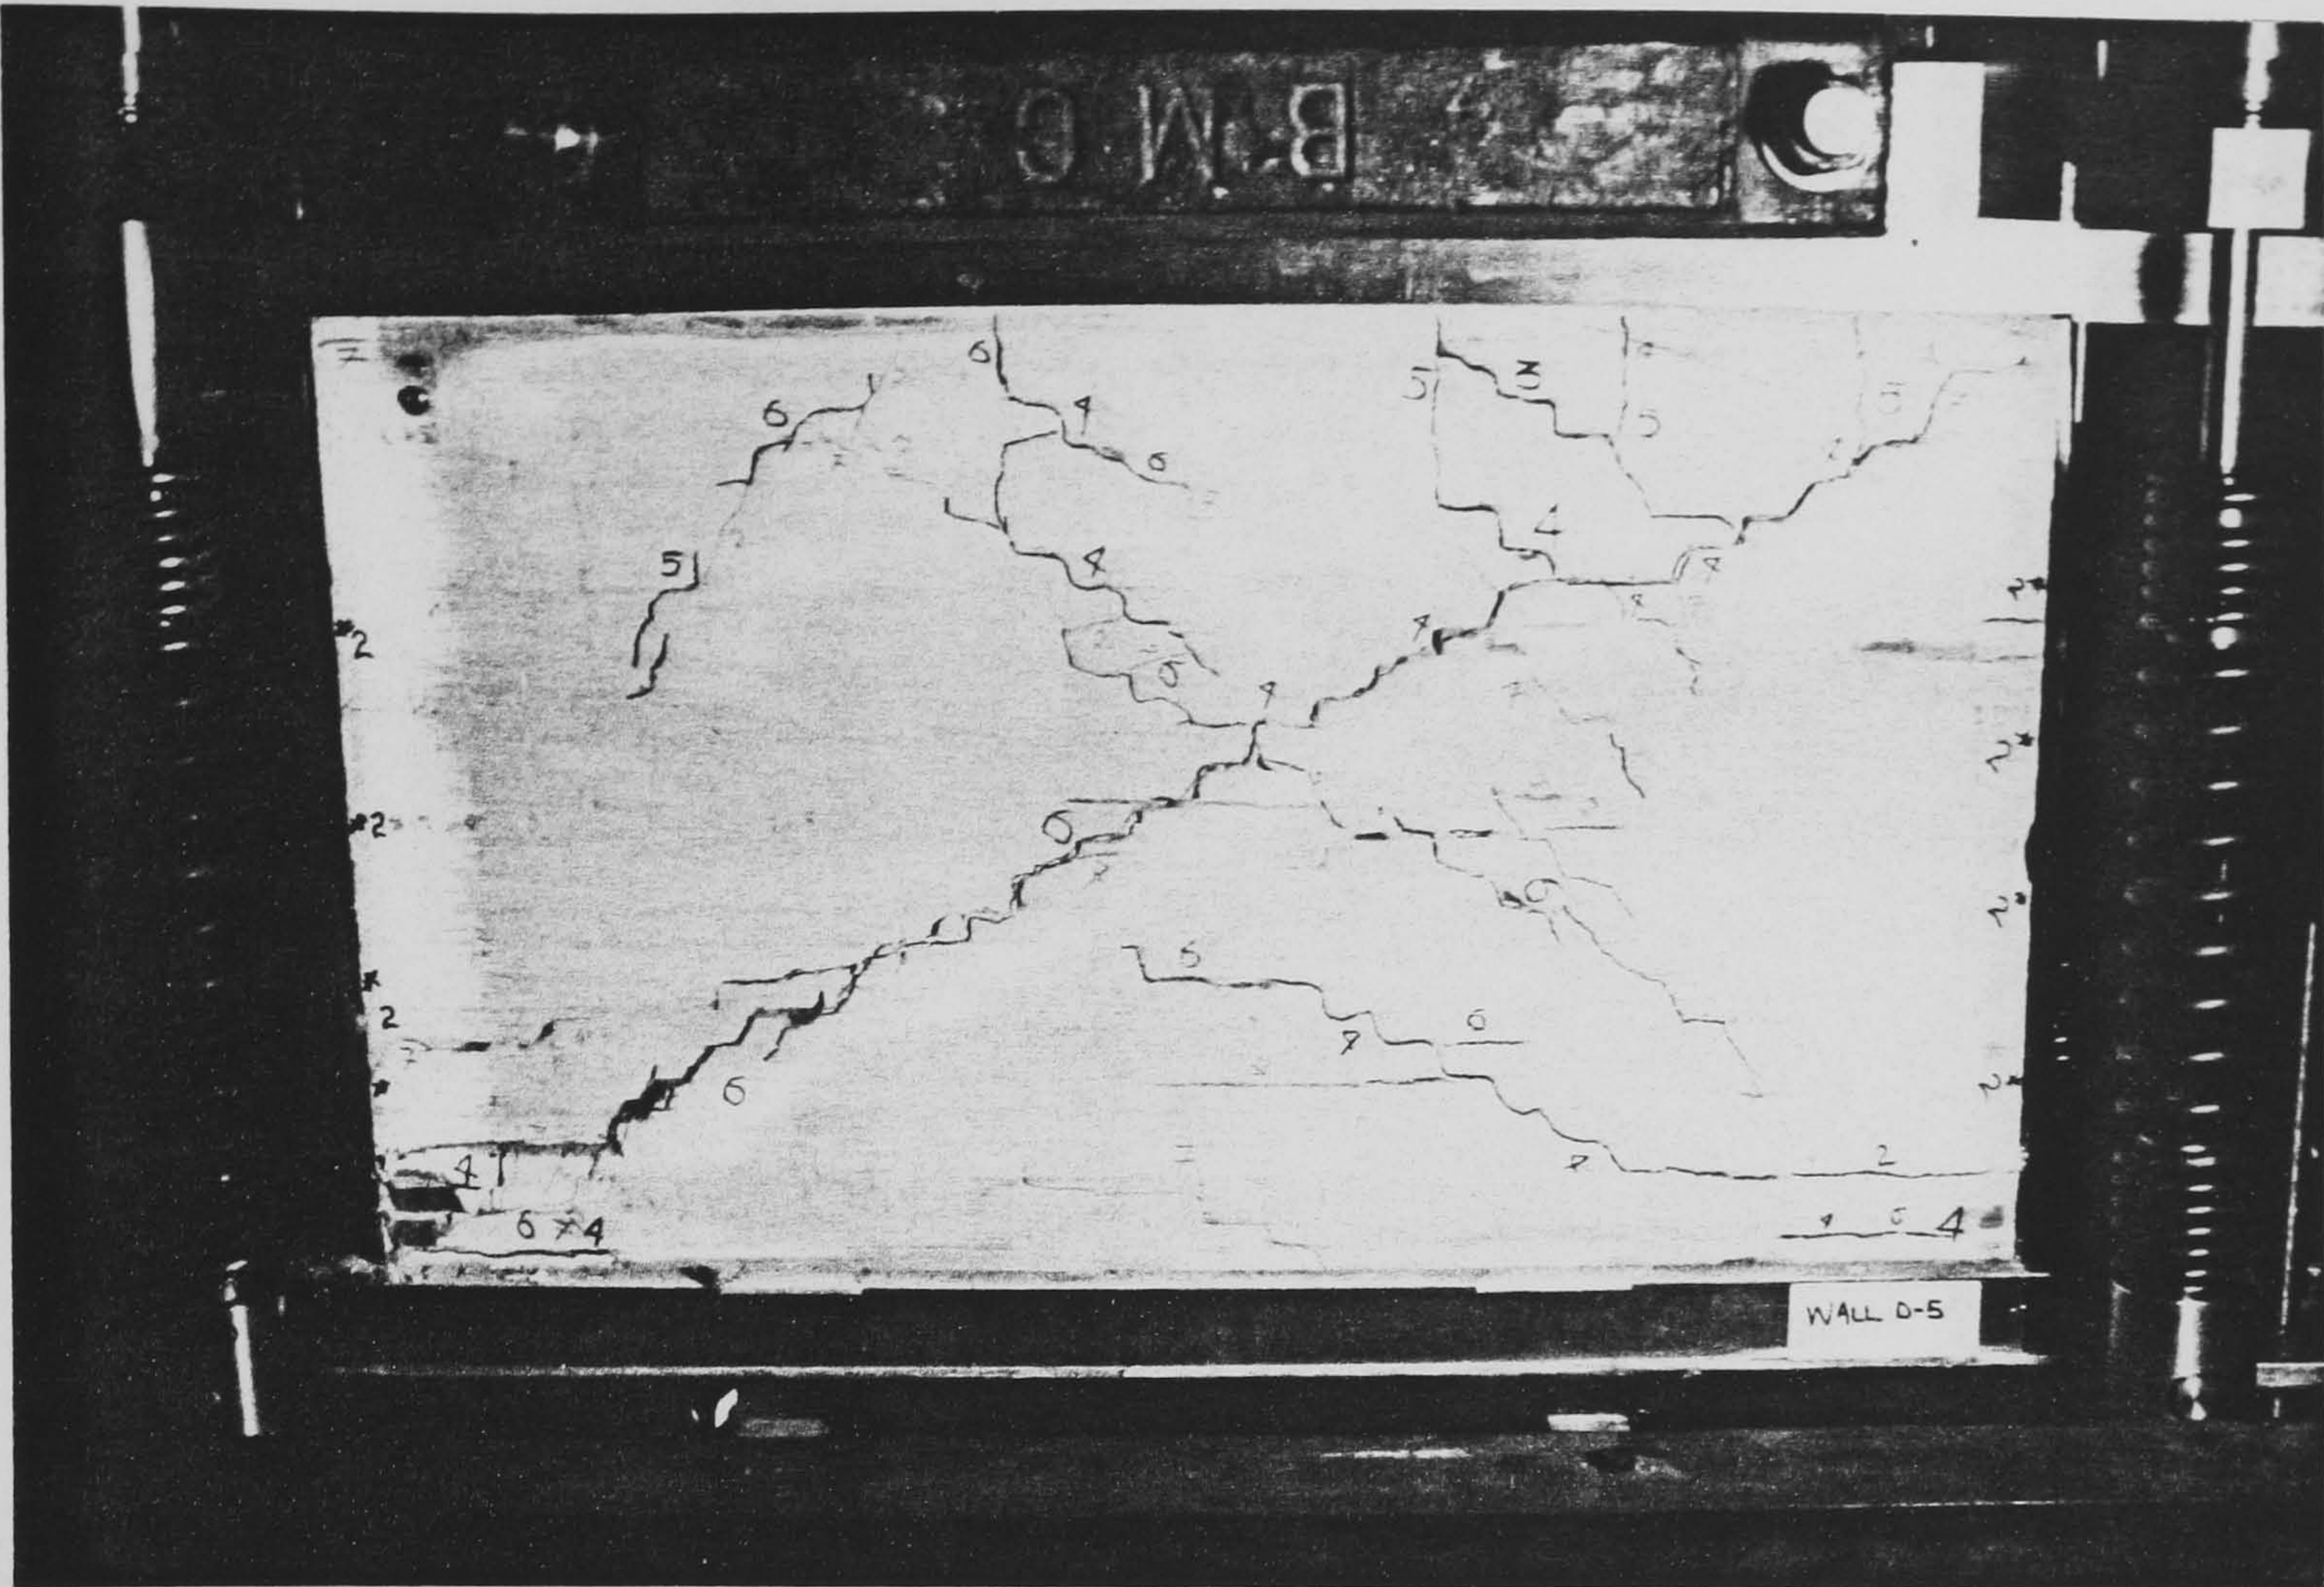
Collapse sequence-frame 1 (wall-D)
